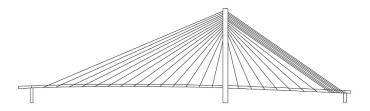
Schematic of Cable-Stayed Bridge Option – Single-Tower
